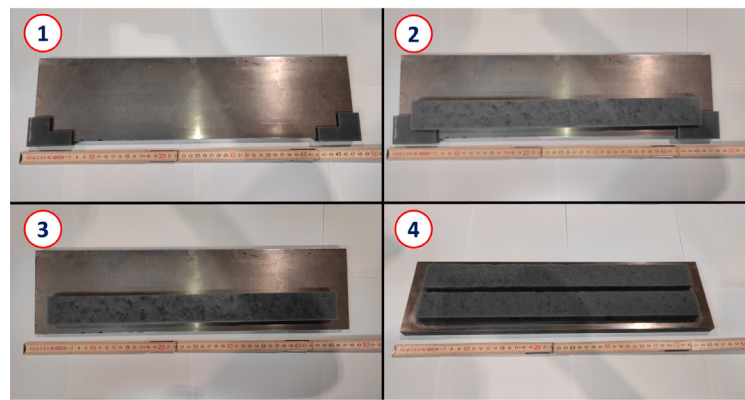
Procedure for gluing surfaces: (1) Jig positioning; (2) Gluing surfaces; (3) Jig remotion; (4) Final result.
